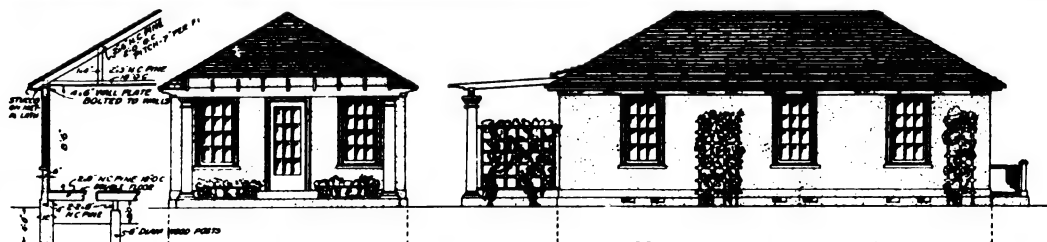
SECTION AND FRONT AND SIDE ELEVATIONS OF COTTAGES IN FIRST GROUP OF 34
